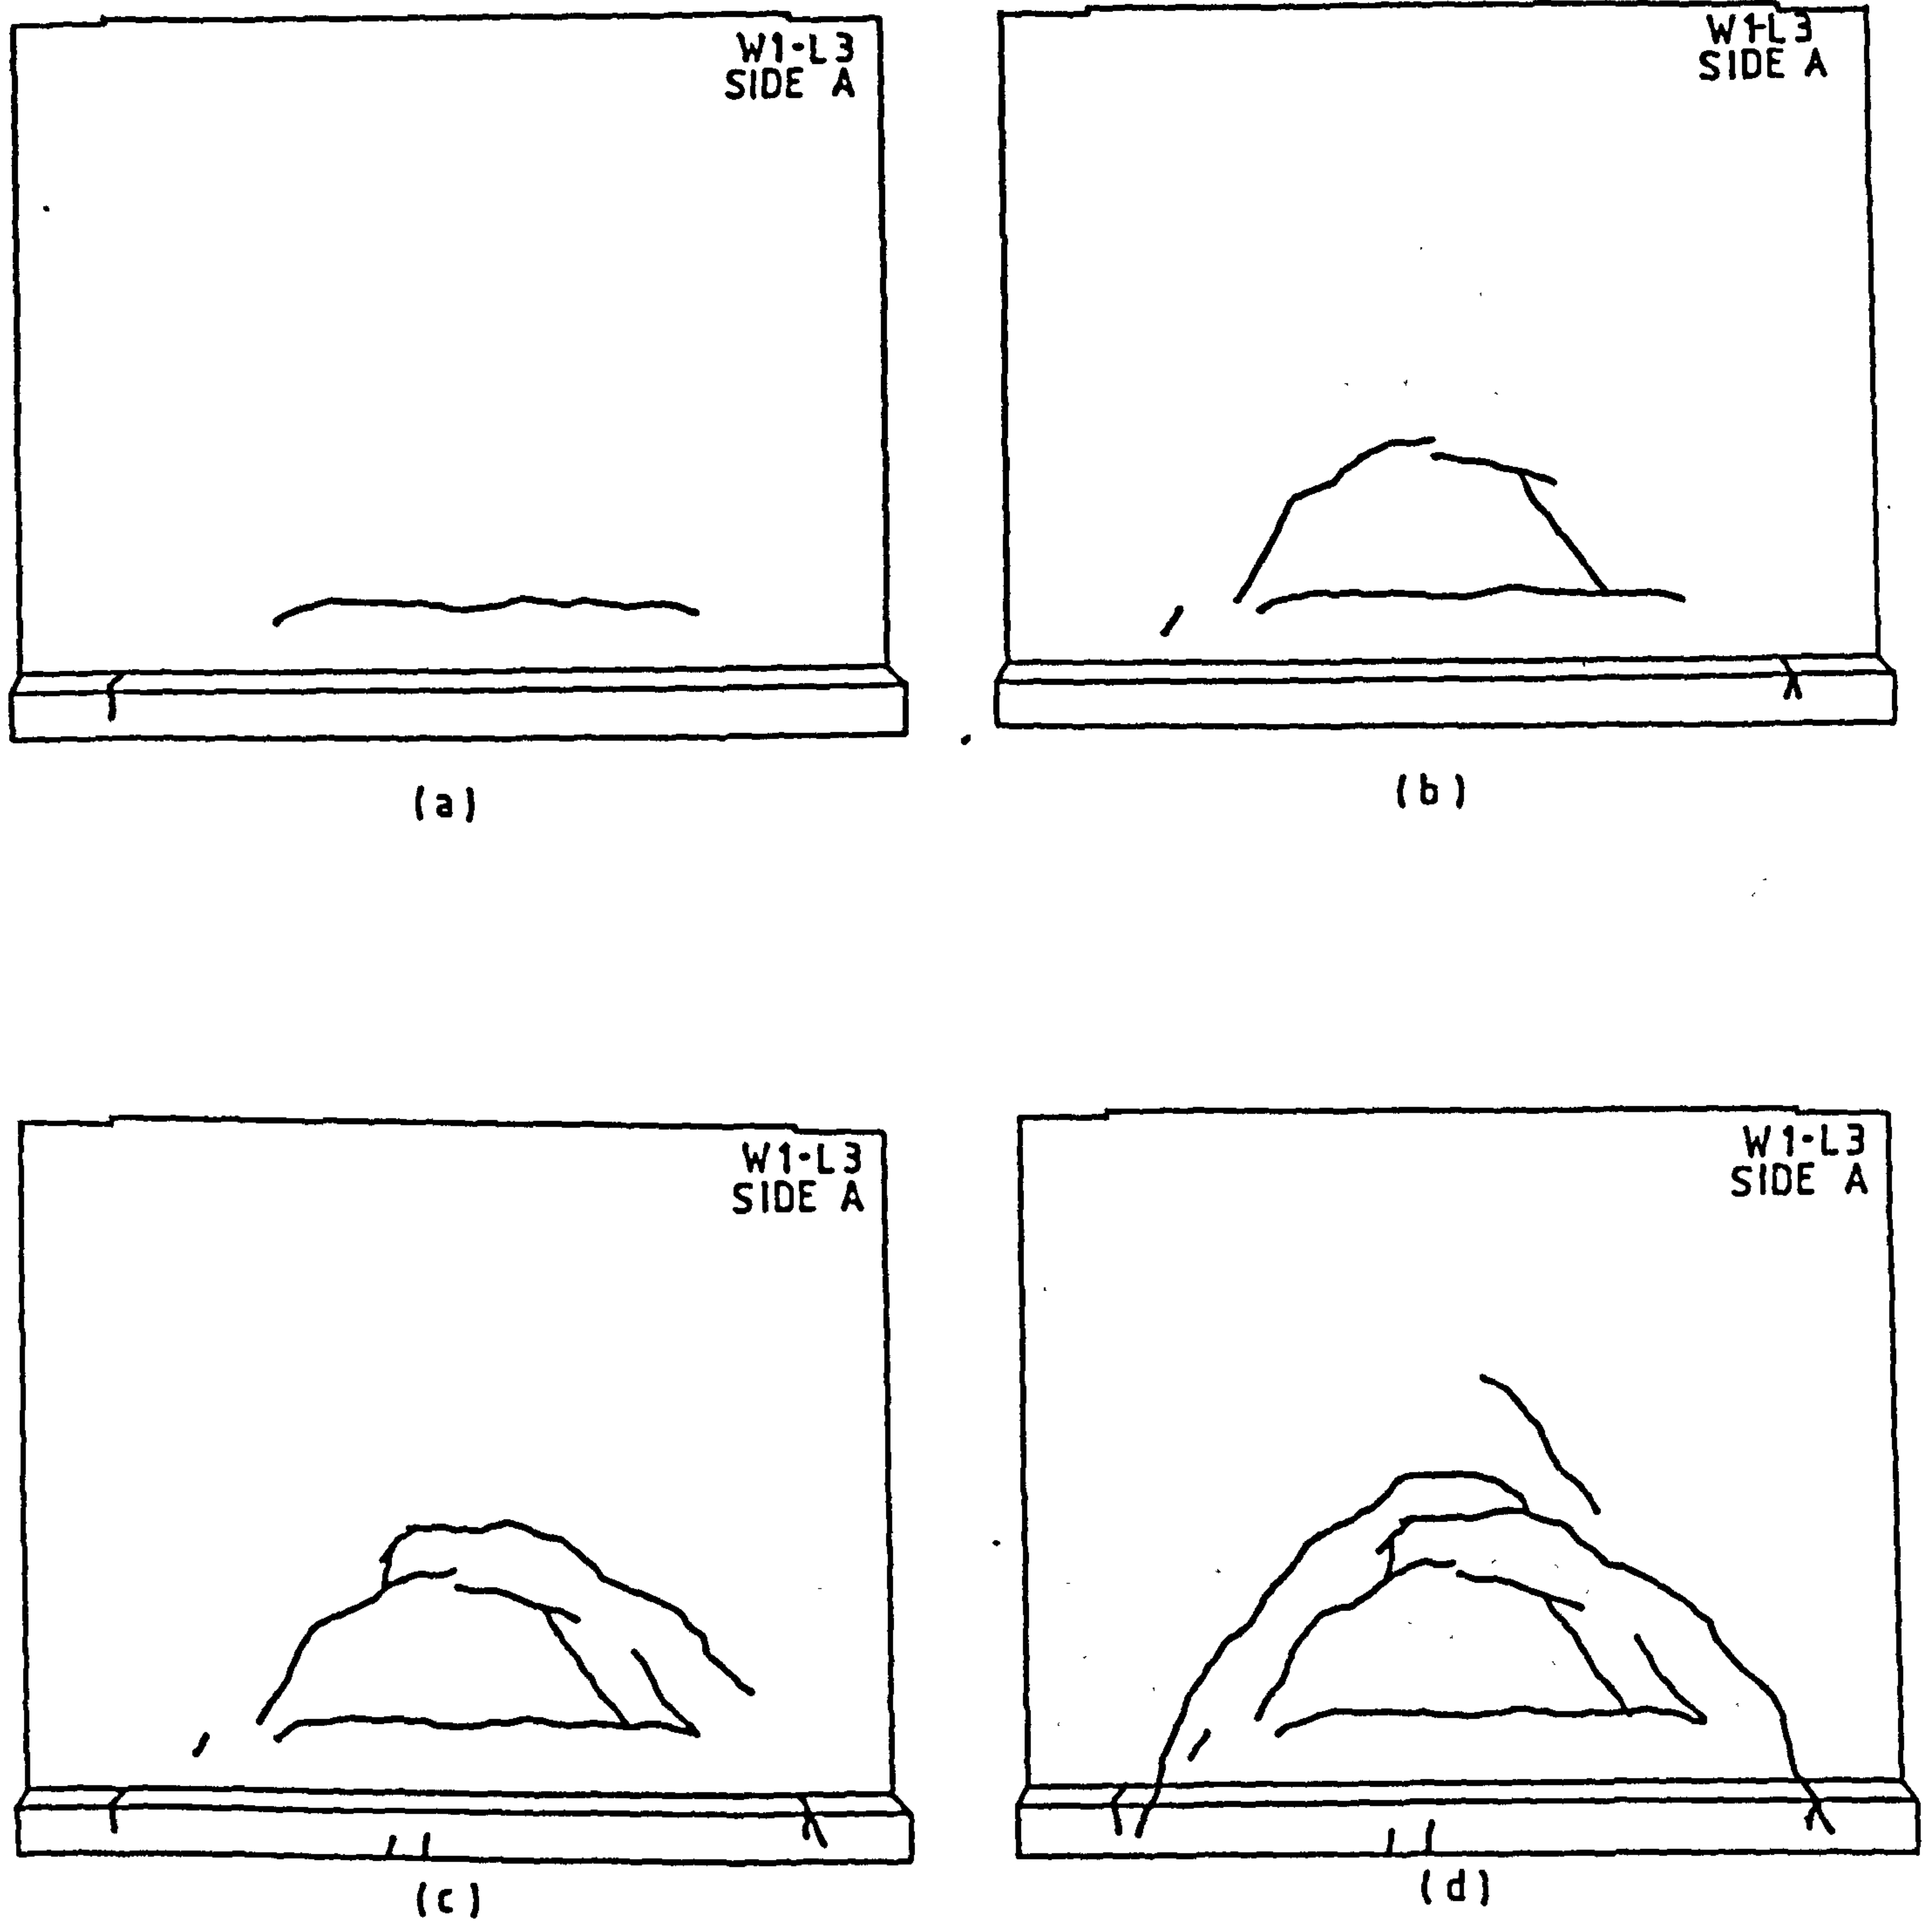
Development of cracks in wall W1-L3
